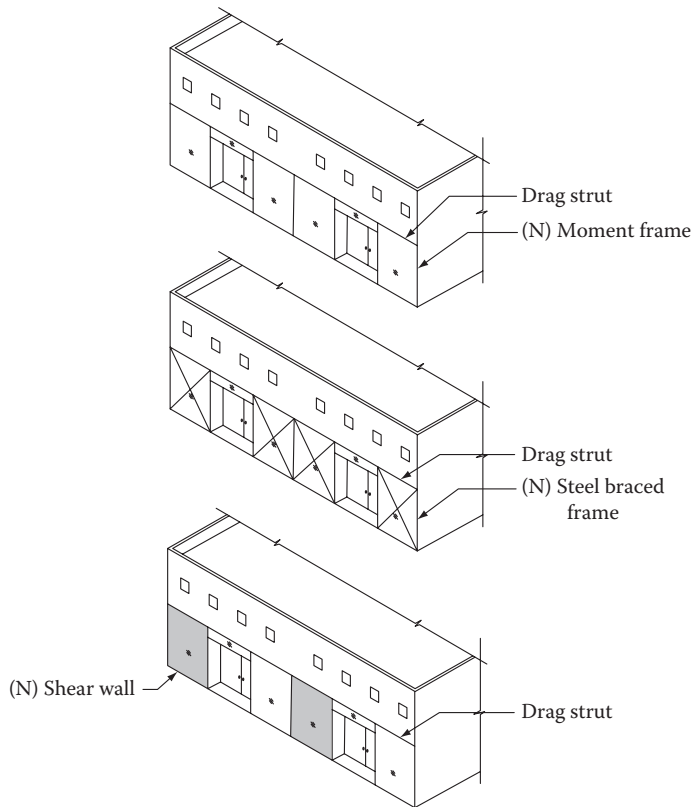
Common methods for upgrading buildings with open storefronts.
